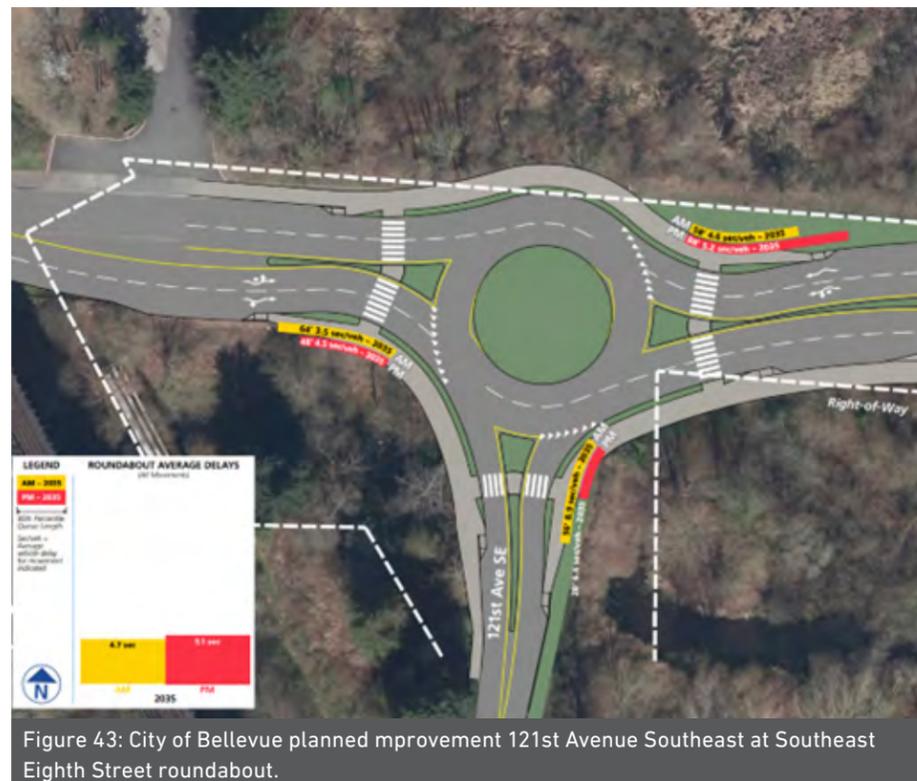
City of Bellevue planned improvement 121st Avenue Southeast at Southeast Eighth Street roundabout.
